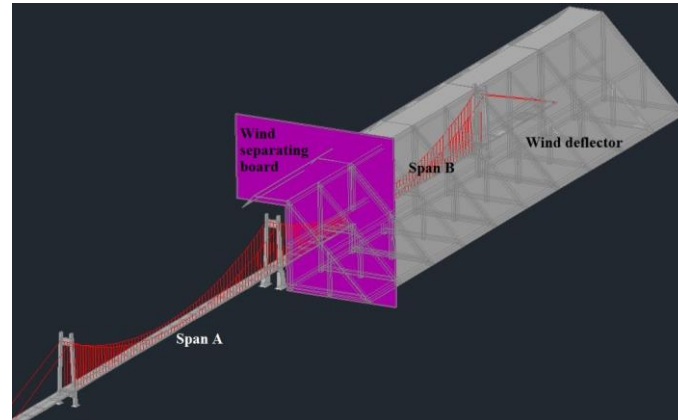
Arrangement of the wind deflector, wind separating board and bridge model
